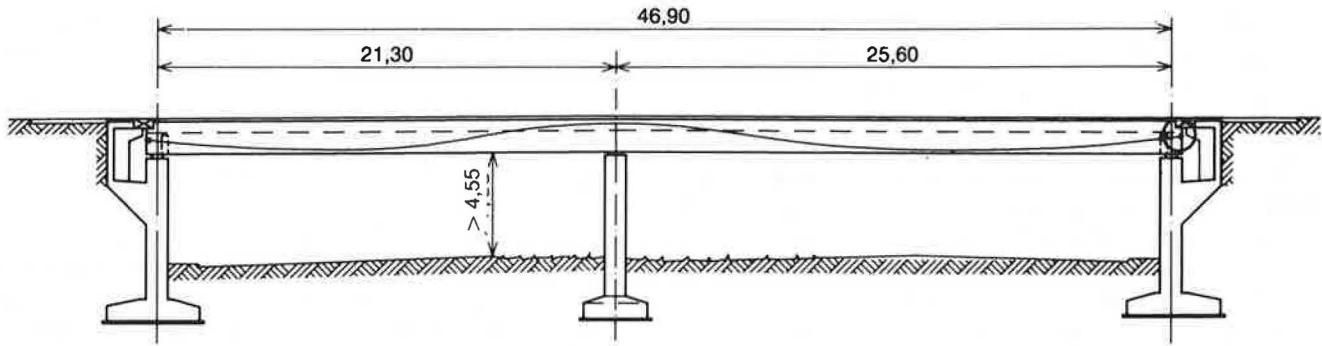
Ulenbergstrasse Road Bridge, Düsseldorf, longitudinal section.
